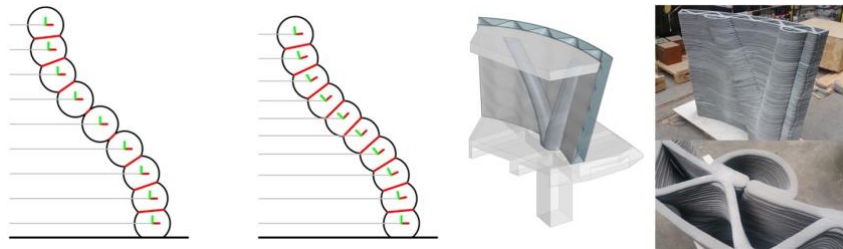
(left) cantilever Method, Tangential Continuity Method (right) structural, bio-inspired soundproofing 3D printed wall [17]
